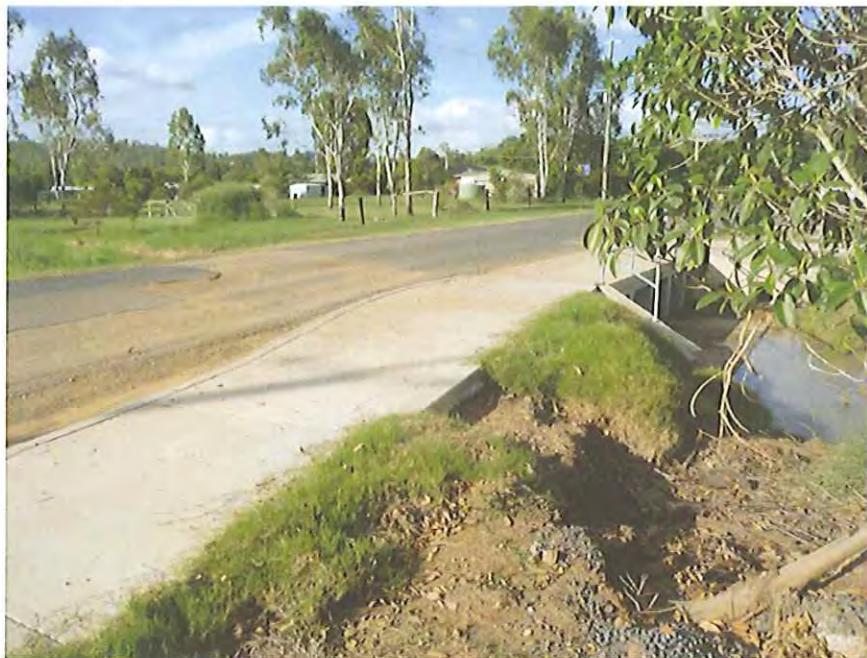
Looking upstream across damaged car park pavement towards the damaged detention basin
